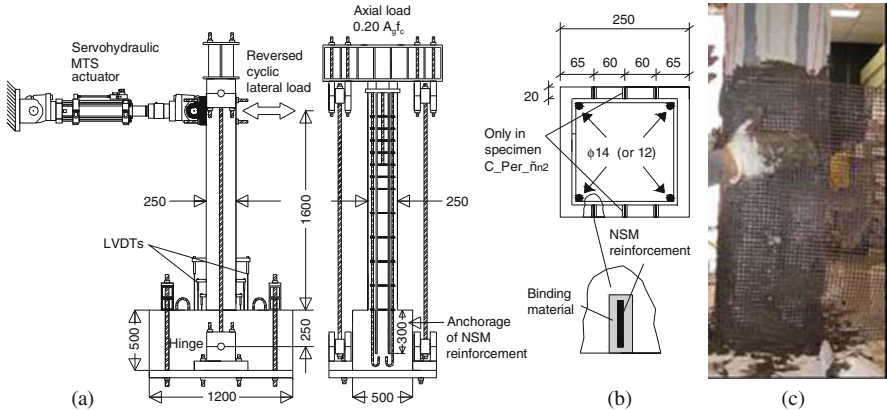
(a) Schematic of test setup. (b) Cross section of columns. (c) NSM reinforcement and application of TRM jacket
